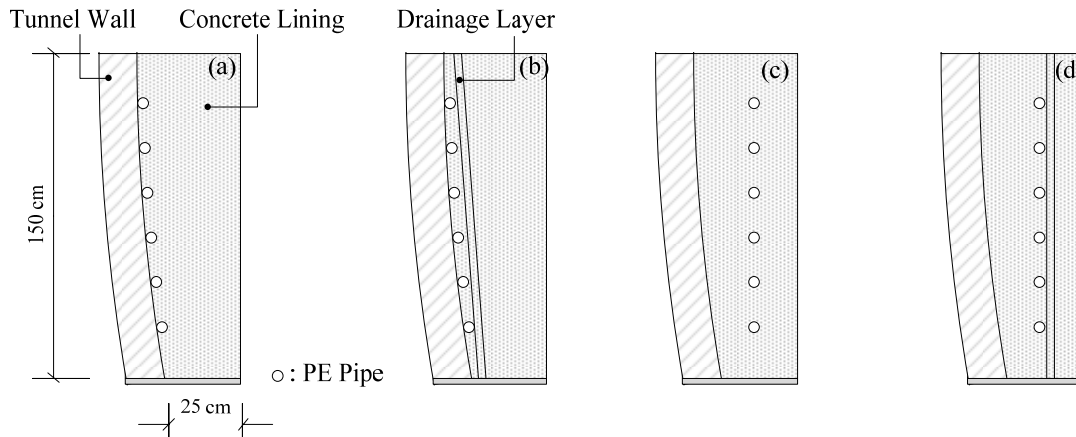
Cross Section of Energy Textiles. (a) Wall-Attached Type, (b) Wall-Attached Type + Drainage Layer, (c) Centered Type, (d) Centered Type + Drainage Layer
